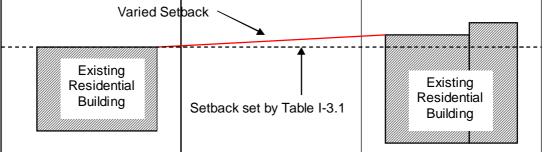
Defining a Front building line Setback Variation based upon adjoining development. (Line drawn between forward most elements on adjoining properties will become the new building line)
